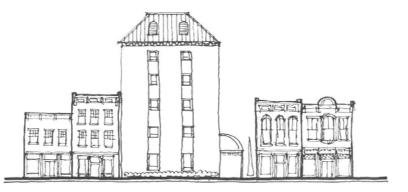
Undesirable, too tall and out of scale with neighboring buildings.
